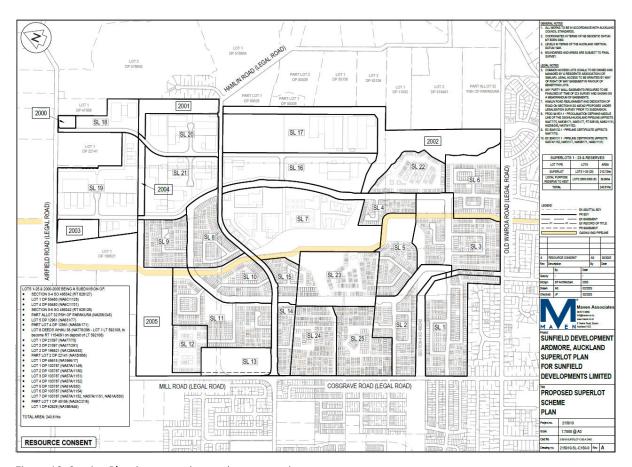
Staging Plan (Source: Scheme Plans, Maven)
